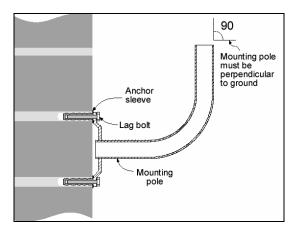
Mounting Pole Installation Using Expansion Sleeves and Lag Bolts
